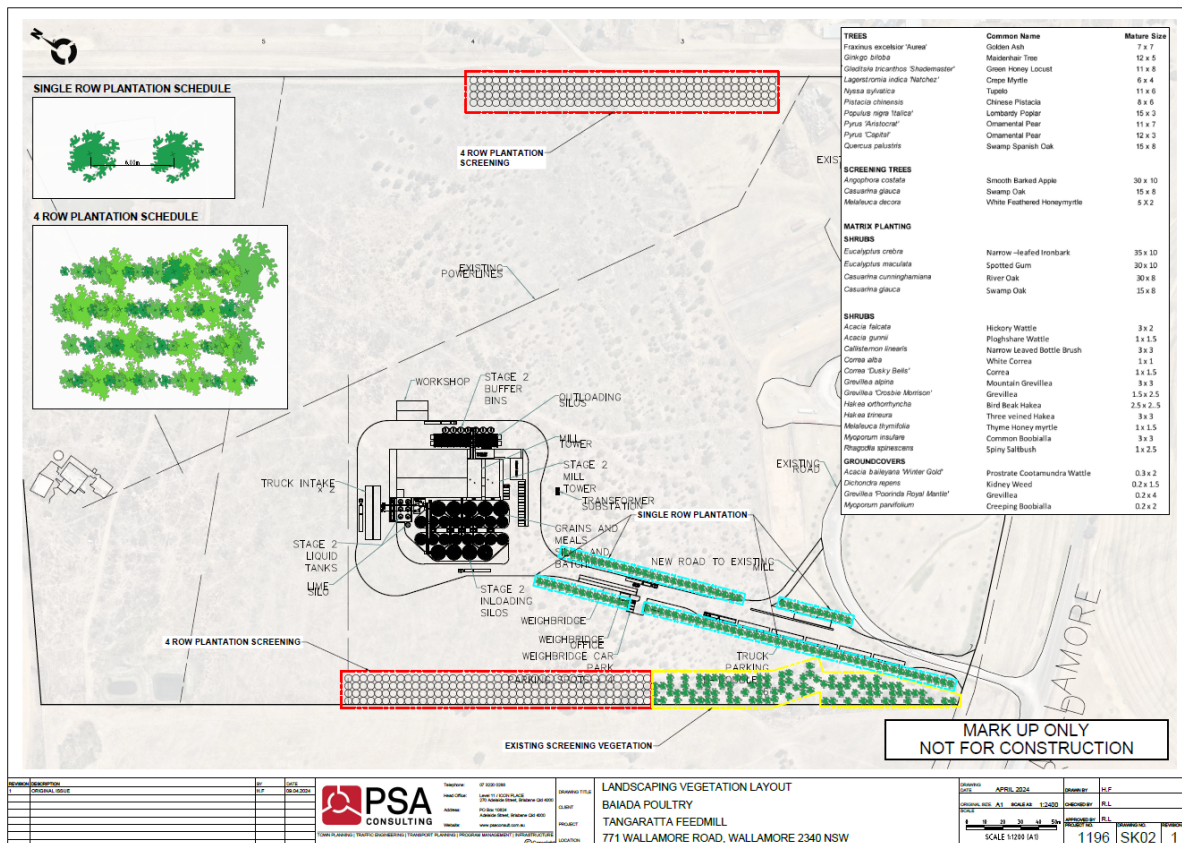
Landscaping Plan (PSA Consulting, 2024)
